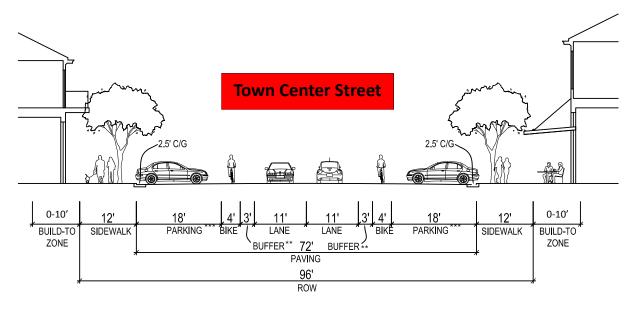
Street Type 1: Town Center Cross Section
